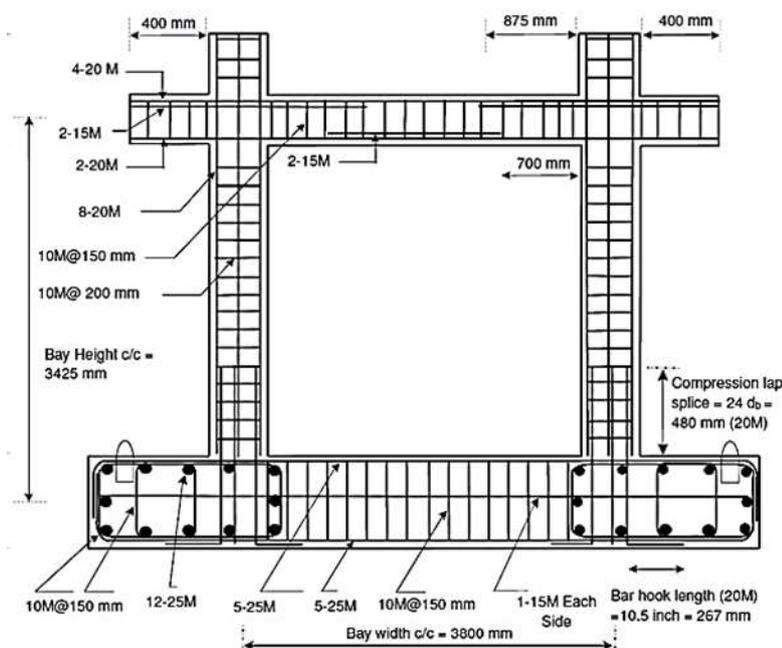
Reinforced concrete frame details (Al-Sadoon, 2016)
